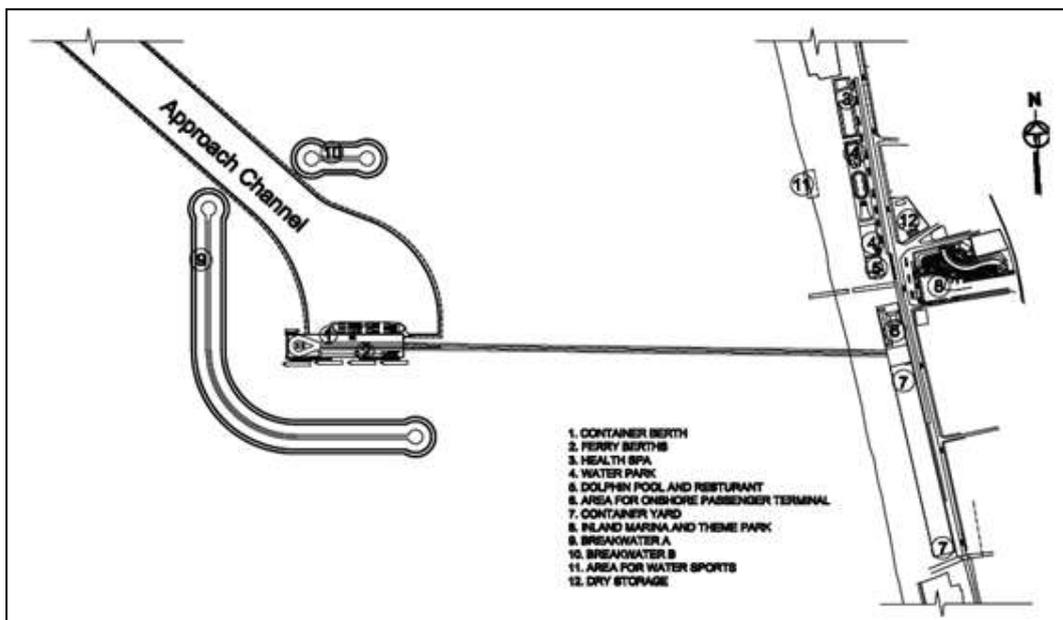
Proposed Breakwater Layout Plan of Alappuzha Port
